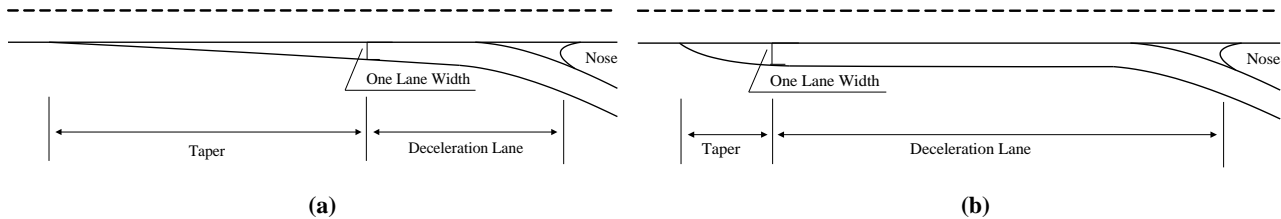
Freeway single-lane exit ramp terminal layout: (a) taper; (b) parallel
